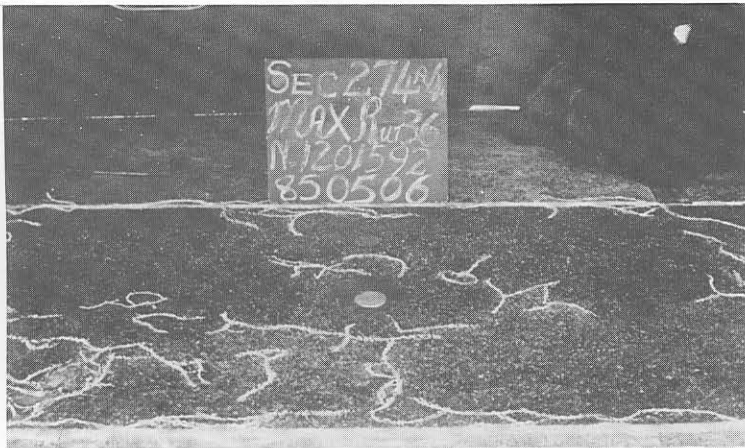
RELATIVELY DEEP PAVEMENT: ROAD 1932 – CRACKING AND DEFORMATION OF HVS TEST SECTION 260A4 (TRAFFICKING DUAL WHEEL LOAD: 40 kN; TYRE PRESSURE: 520 kPa).
